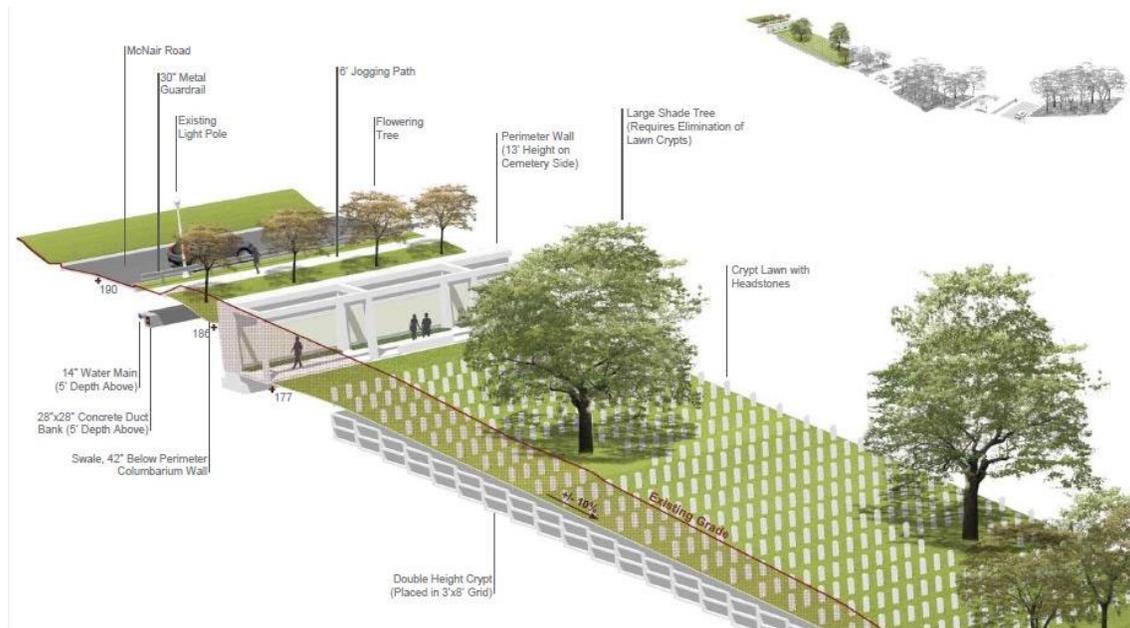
Site Section Detail – In-ground burials and Columbarium Niche Wall
